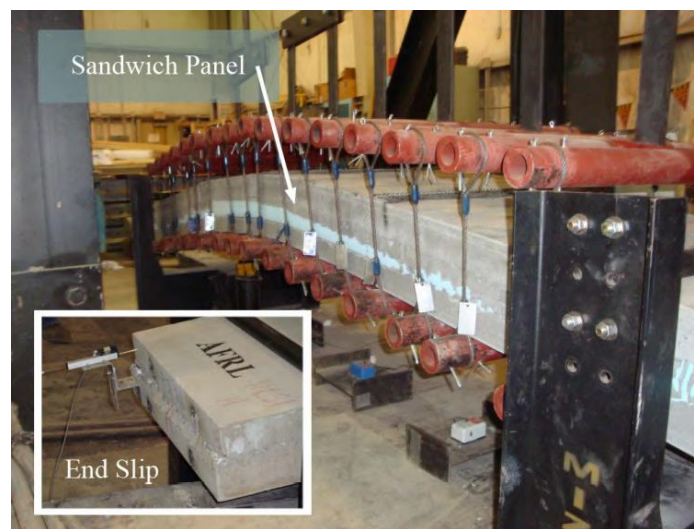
Single-span Loading Tree (Naito 2011a)
